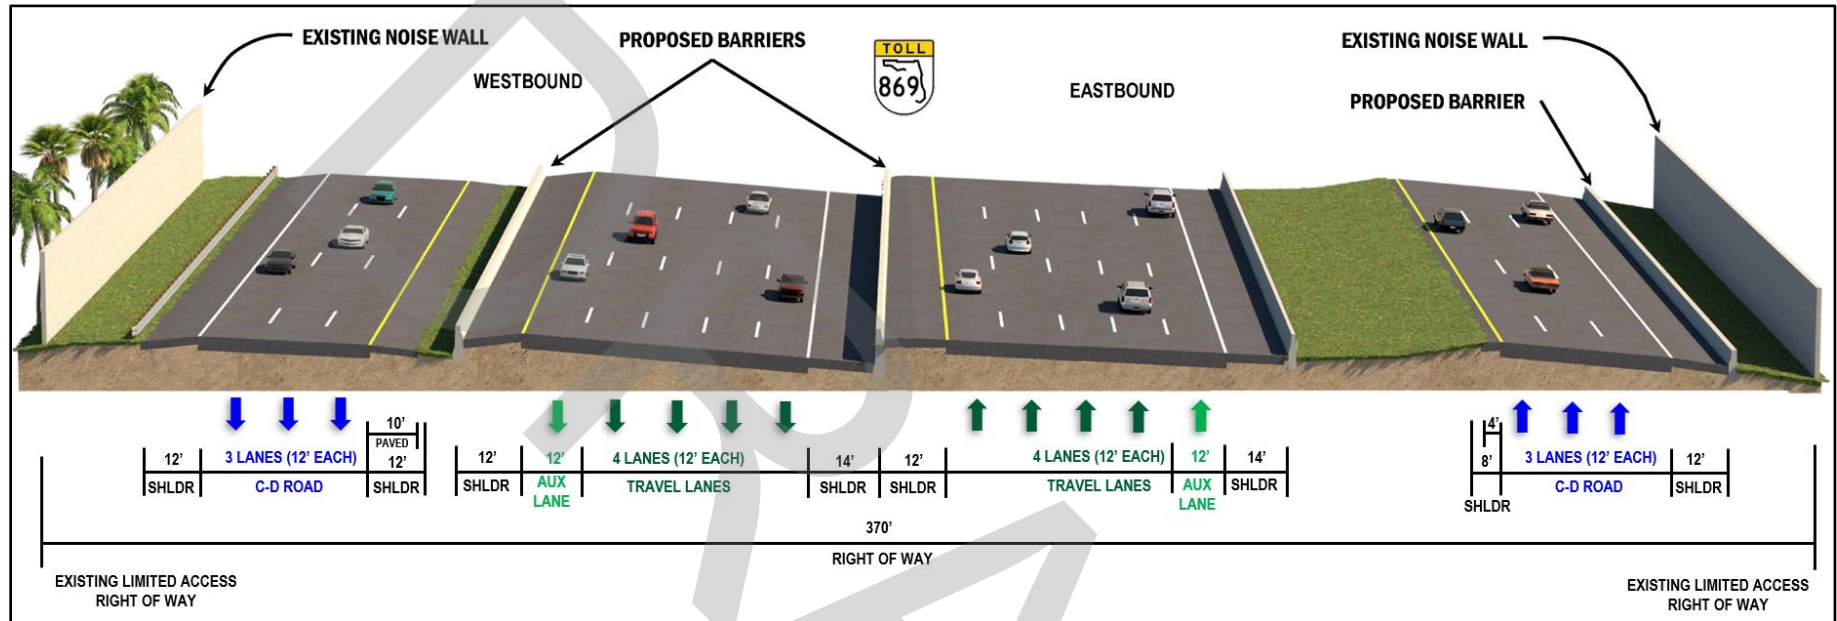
Preferred Alternative Roadway Section between Lyons Road and Florida's Turnpike
